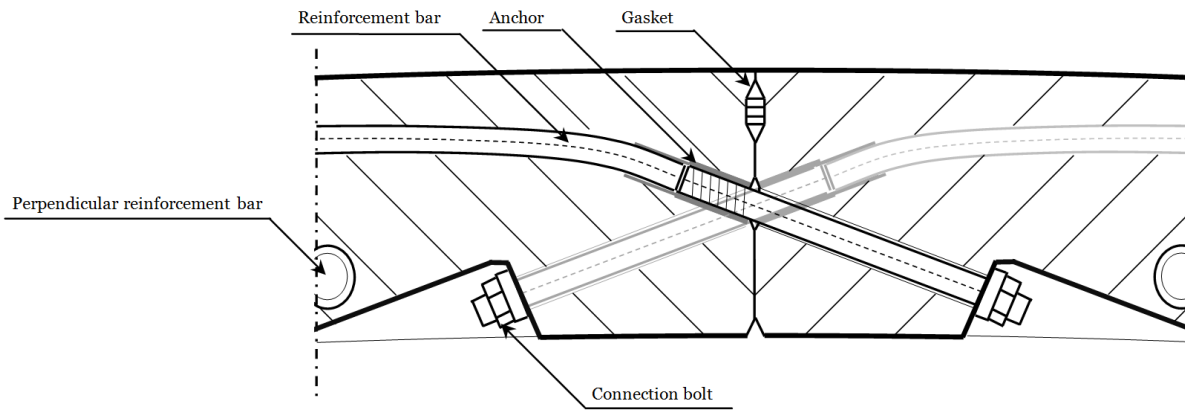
Vertical & horizontal cross-section of local connection between two elements; not to scale
